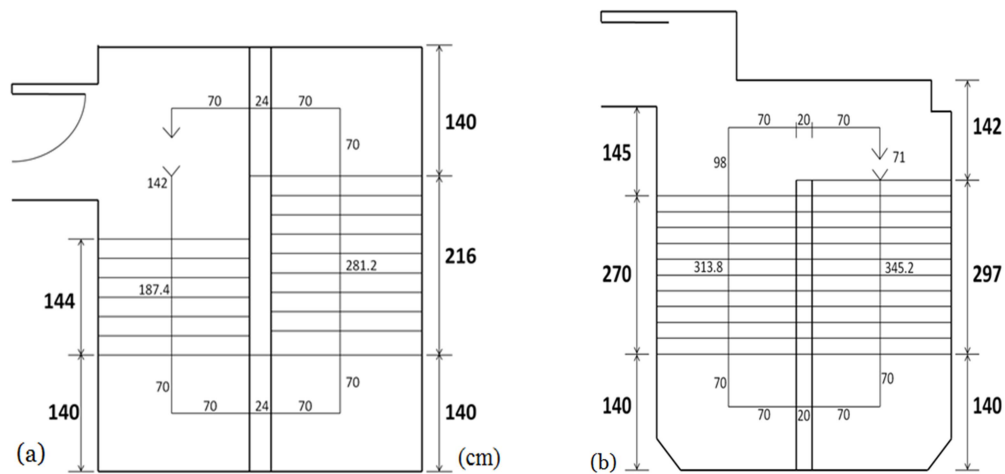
Dimension of building stairs, Taipei 101 stair section on the 7th-89th floor (a); New Taipei City Hall on the 8th-19th floor (b).
